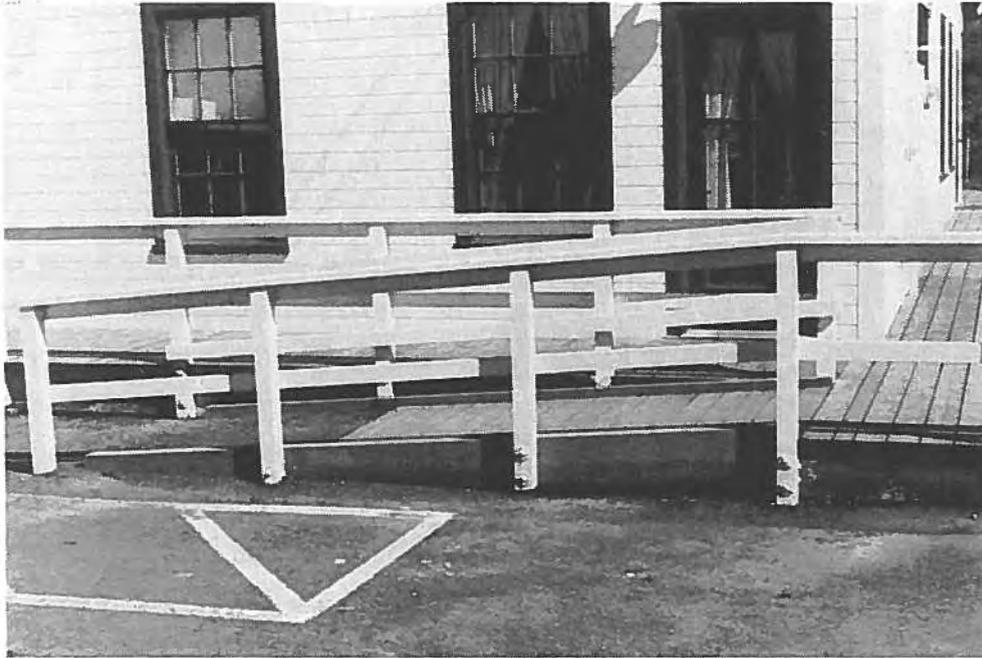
New handicap accessible ramp and footwalks on the east and south elevations of the boathouse.
